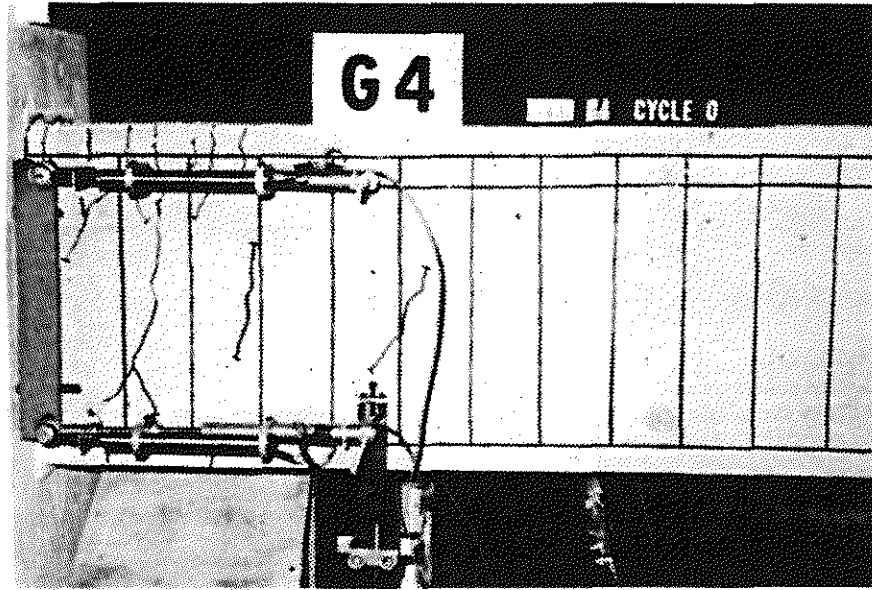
(a) Pretest Crack Pattern, Beam G-4
